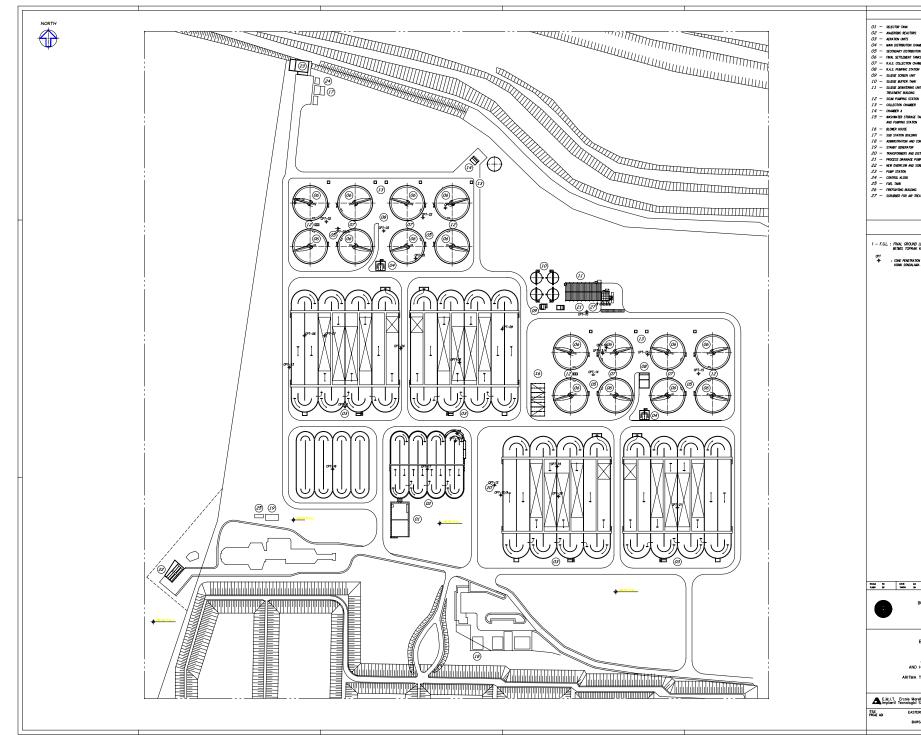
CPT Layout of Bursa East Waste Water Treatment Plant
